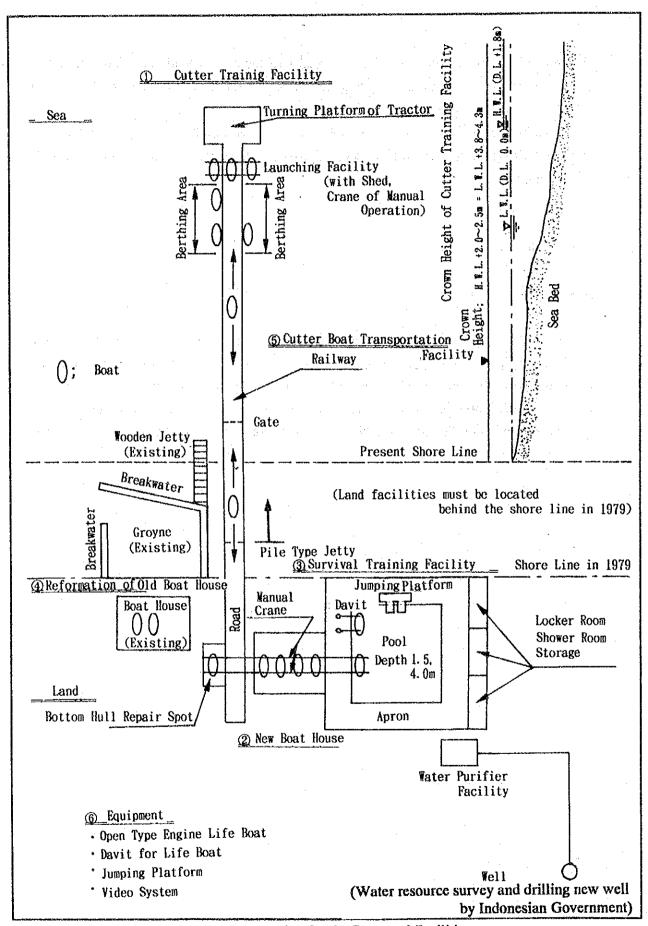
Layout Plan for the Proposed Facilities
